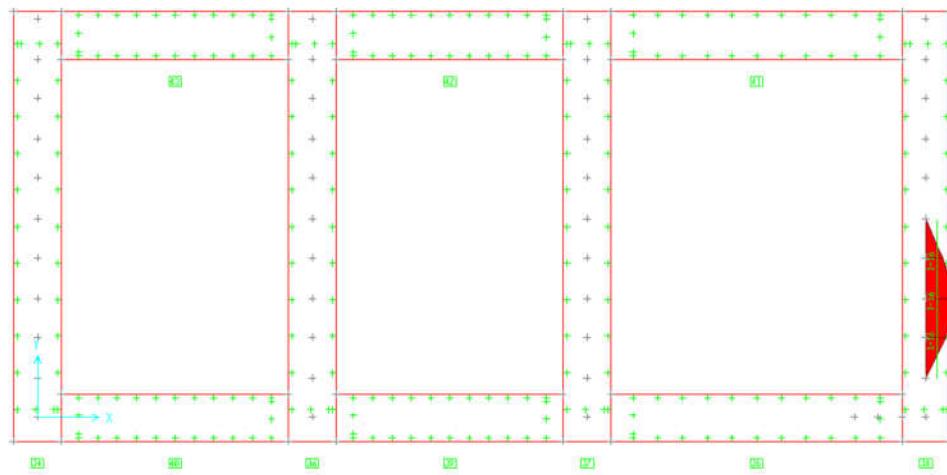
Y DIRECTION REINFORCEMENT DESIGN
